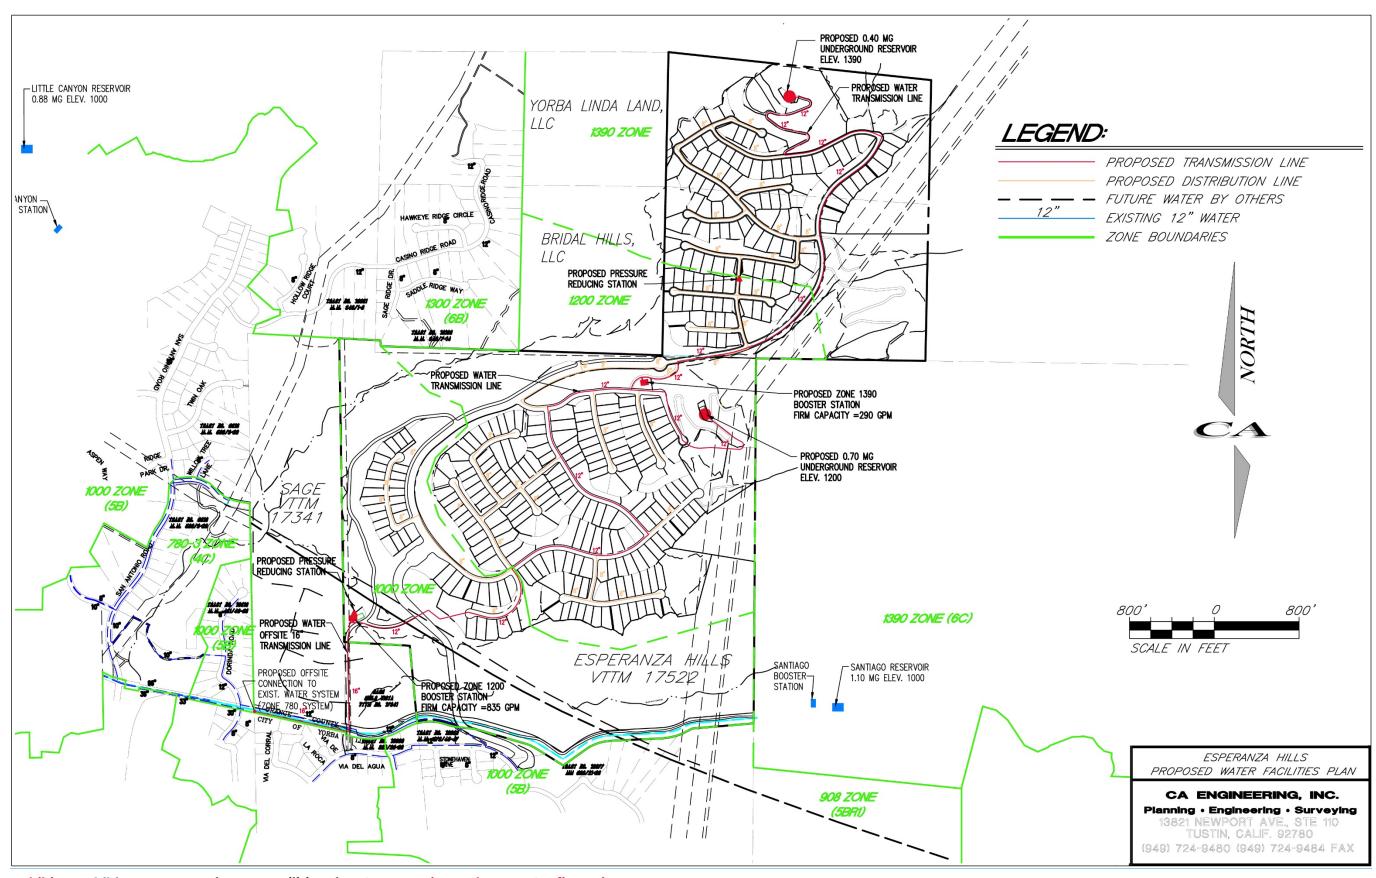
Exhibit 16 - Proposed Water Facilities Plan, San Antonio Road Access Configuration
